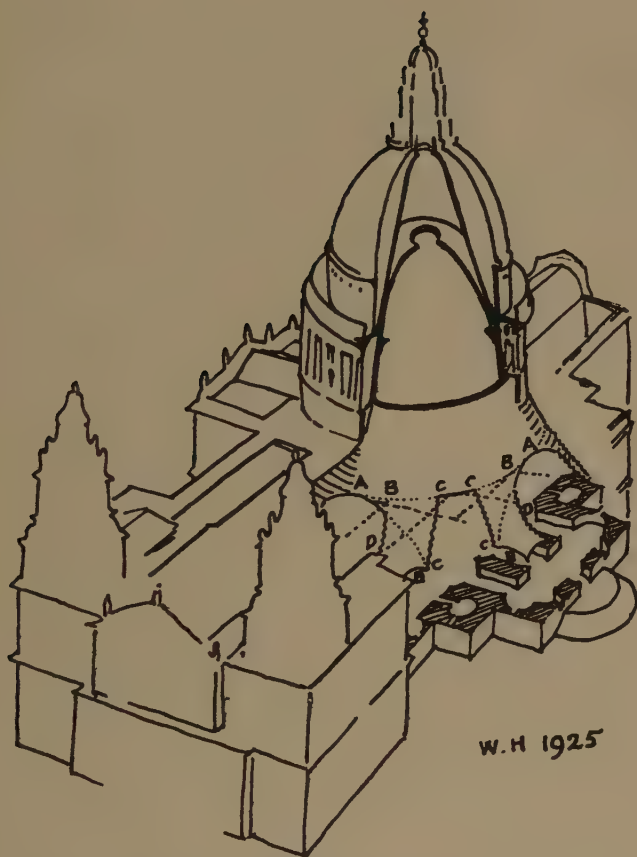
Principal lines of reinforcement around reinforced concrete cone.
